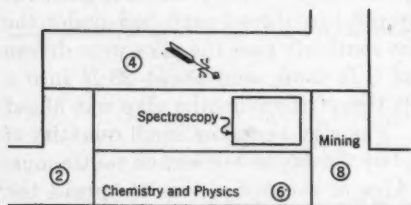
KEY PLAN, NEW EASTMAN LABORATORY.
